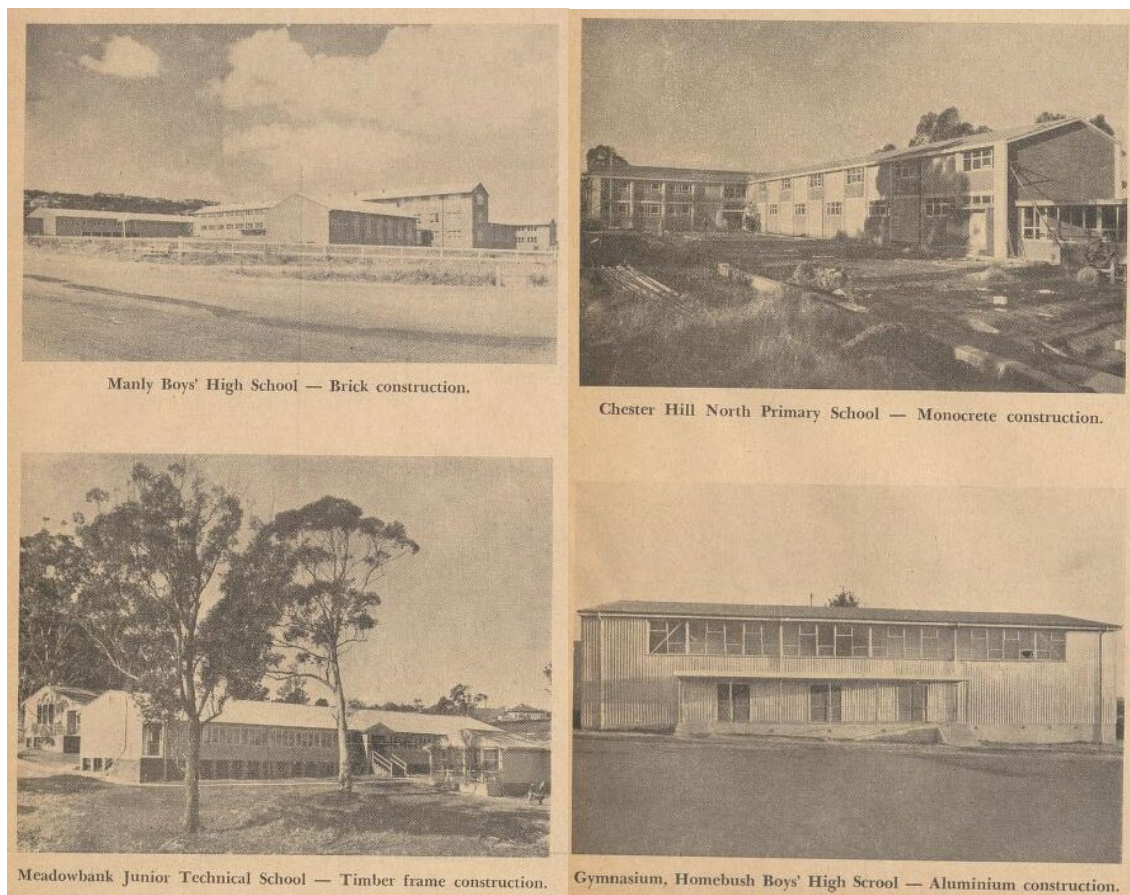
Examples of common construction methods used for NSW school buildings in the mid-1950s.
